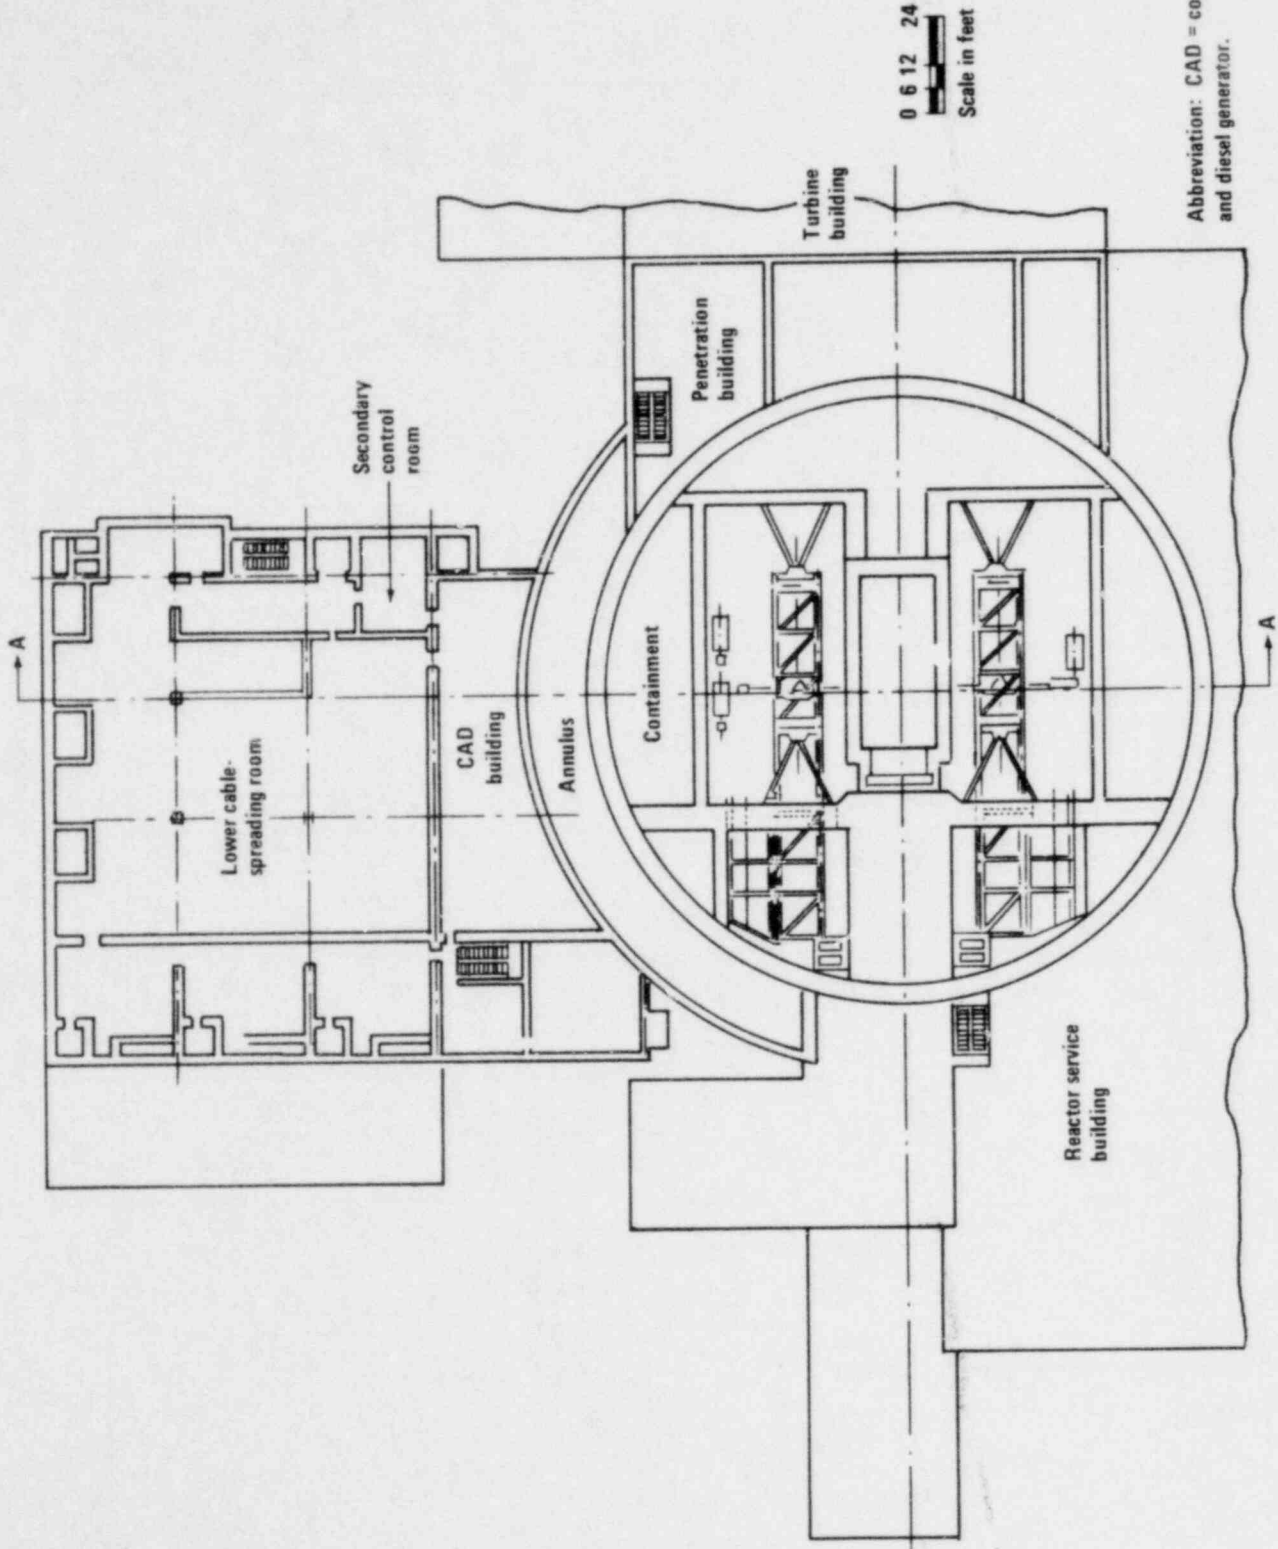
General arrangement of safety-related structures; plan, elevation 14 ft-3 in.
